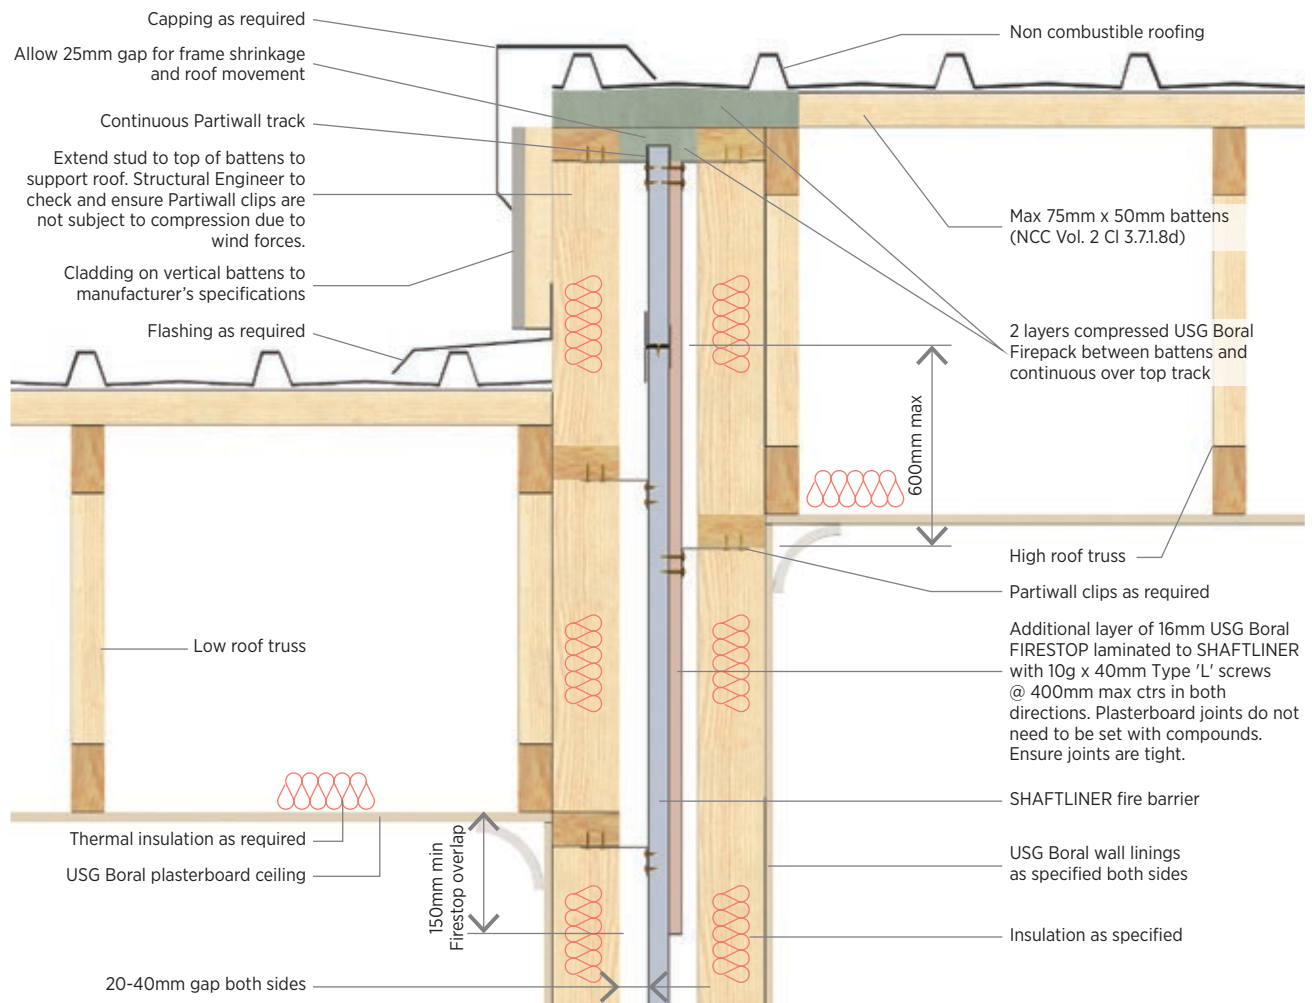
Staggered Roof Detail - Metal Roof - FRL 60/60/60
